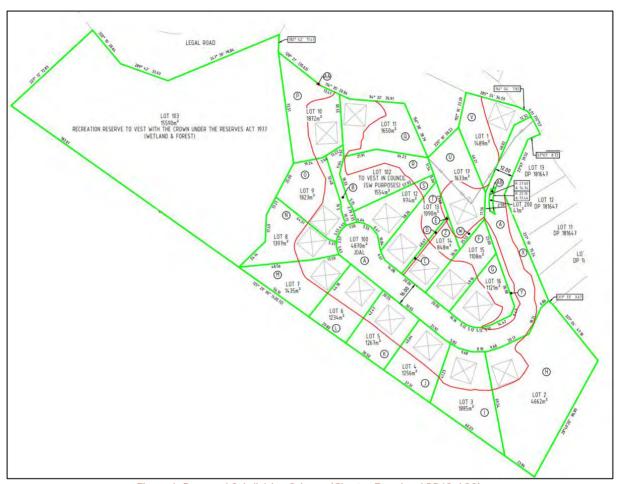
Proposed Subdivision Scheme (Chester Drawing 15569-120)
